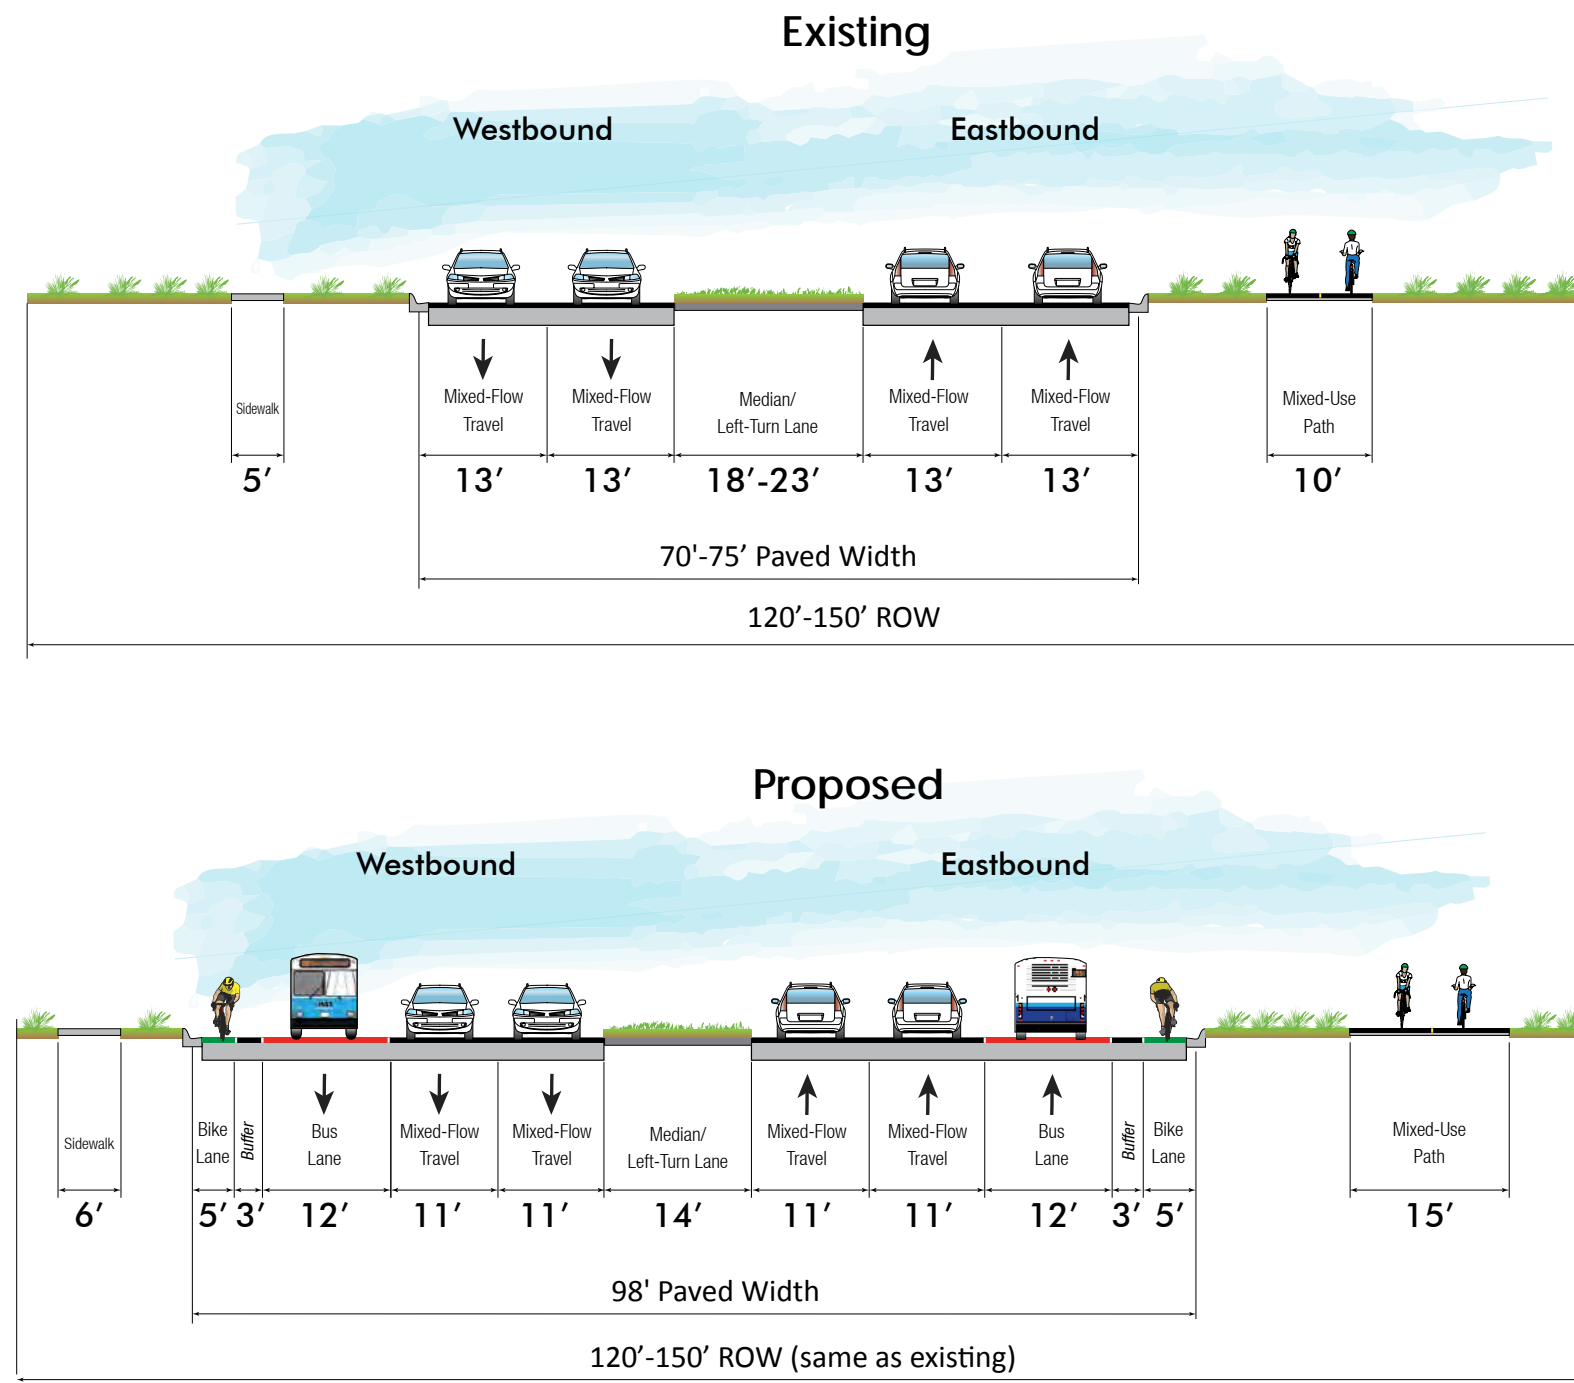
Typical Cross Section: Imjin Parkway (Imjin Road to 2nd Avenue)
